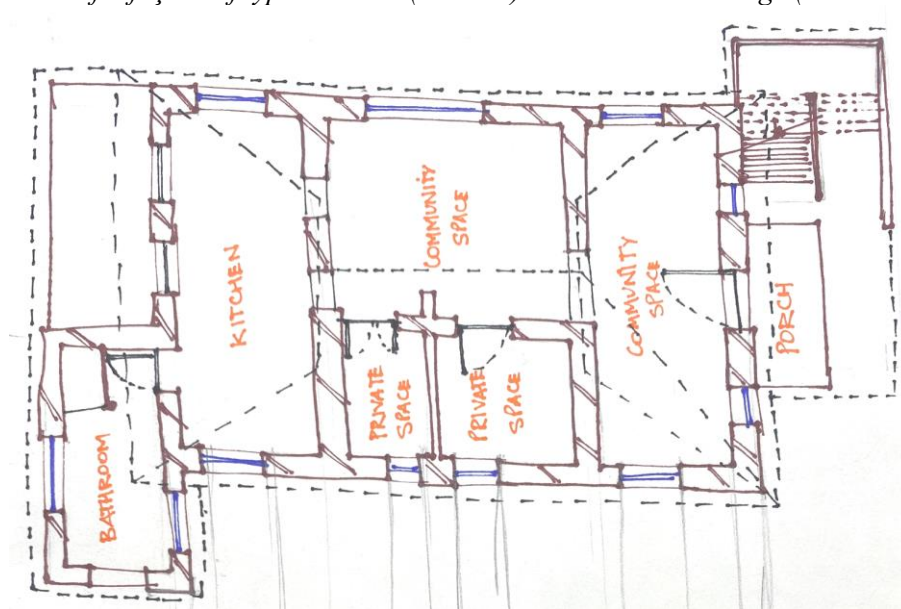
Sketch of a plan and elevation of a typical house at the Ranwar Village (Kishnadwala, 2021)
